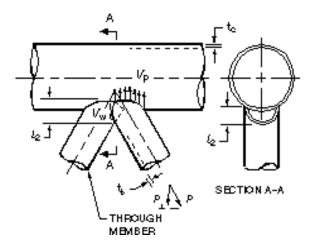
Detail of Overlapping Joint (see 2.40.1.6)
